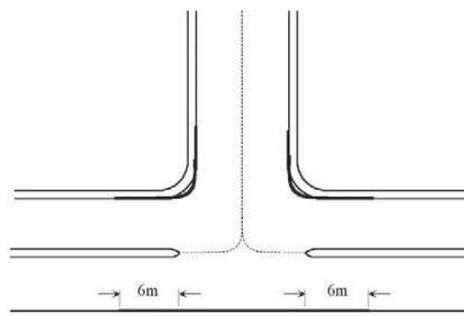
Driveways Prohibited On The Opposite Side Of The Road Or Within 6m Of Median Opening
